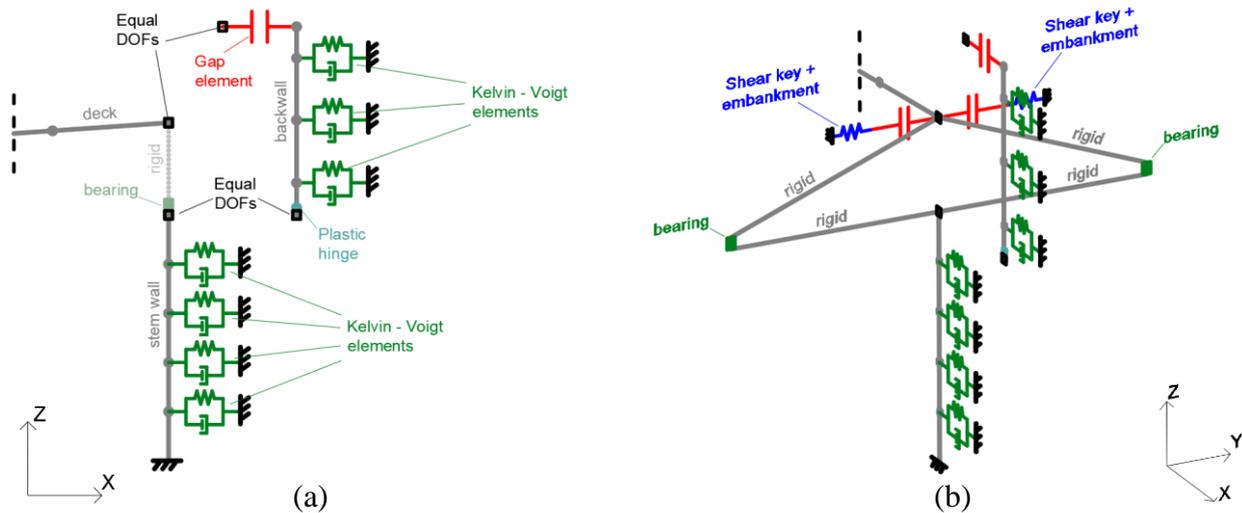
(a) Longitudinal section and (b) 3-d view of the ‘detailed’ abutment-backfill model
